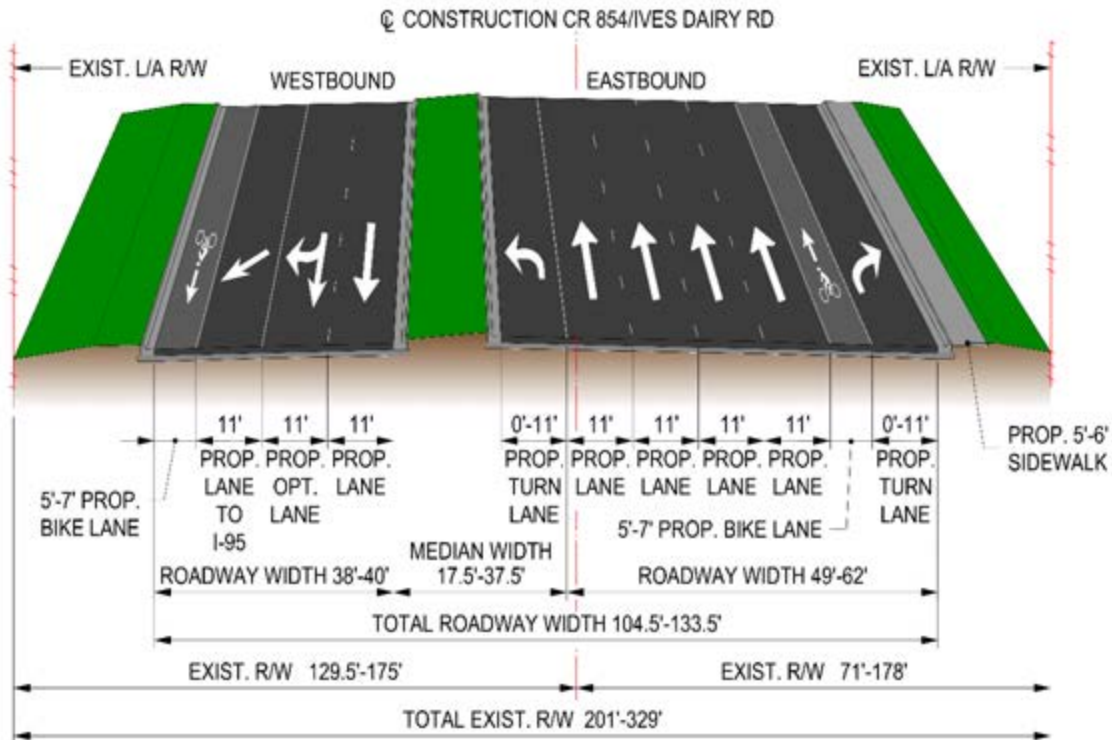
4: Proposed Configuration - Alternative 1 – CR 854/Ives Dairy Road
